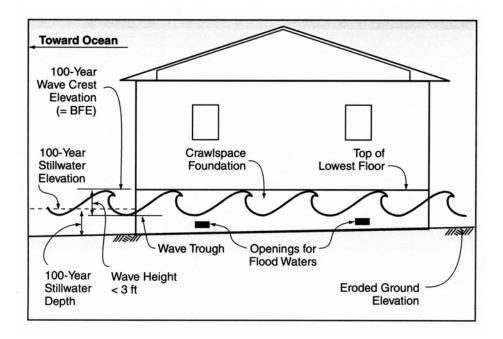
Minimum NFIP A-zone standards require that the lowest floor be at or above the Base Flood Elevation (BFE). Foundation walls below the BFE must be equipped with openings to allow equal interior and exterior hydrostatic pressures. Reprinted with permission from the FEMA Coastal Construction Manual (FEMA, 2000).
